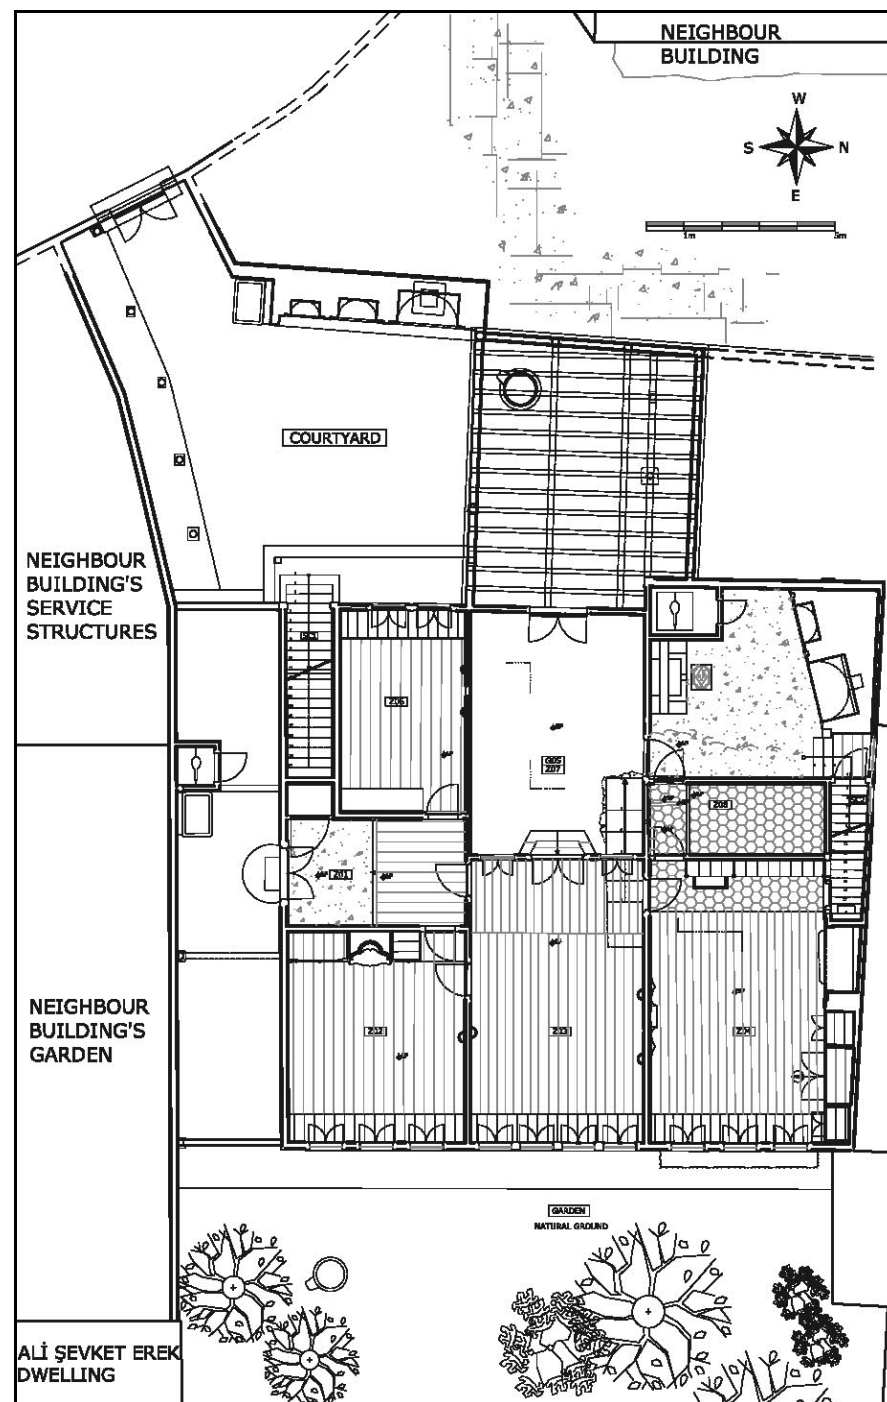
Restitution Phase II – Ground Floor Plan: 1/200 (Presented in 1/100 at Jury)
